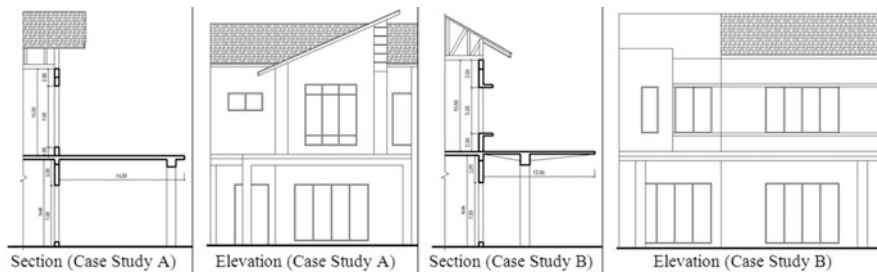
Section and elevation in the Case Study A and B of the early terraced house facade
